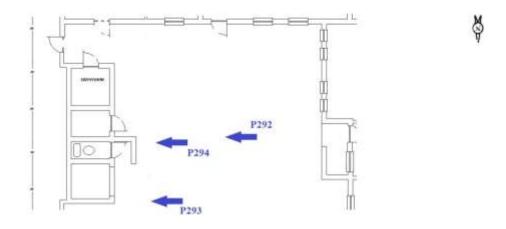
Above is the schematic representation of the layout of Drawing 14 with places where photos were taken from are marked. (*Drawing S.M. Miller 2016.*)
